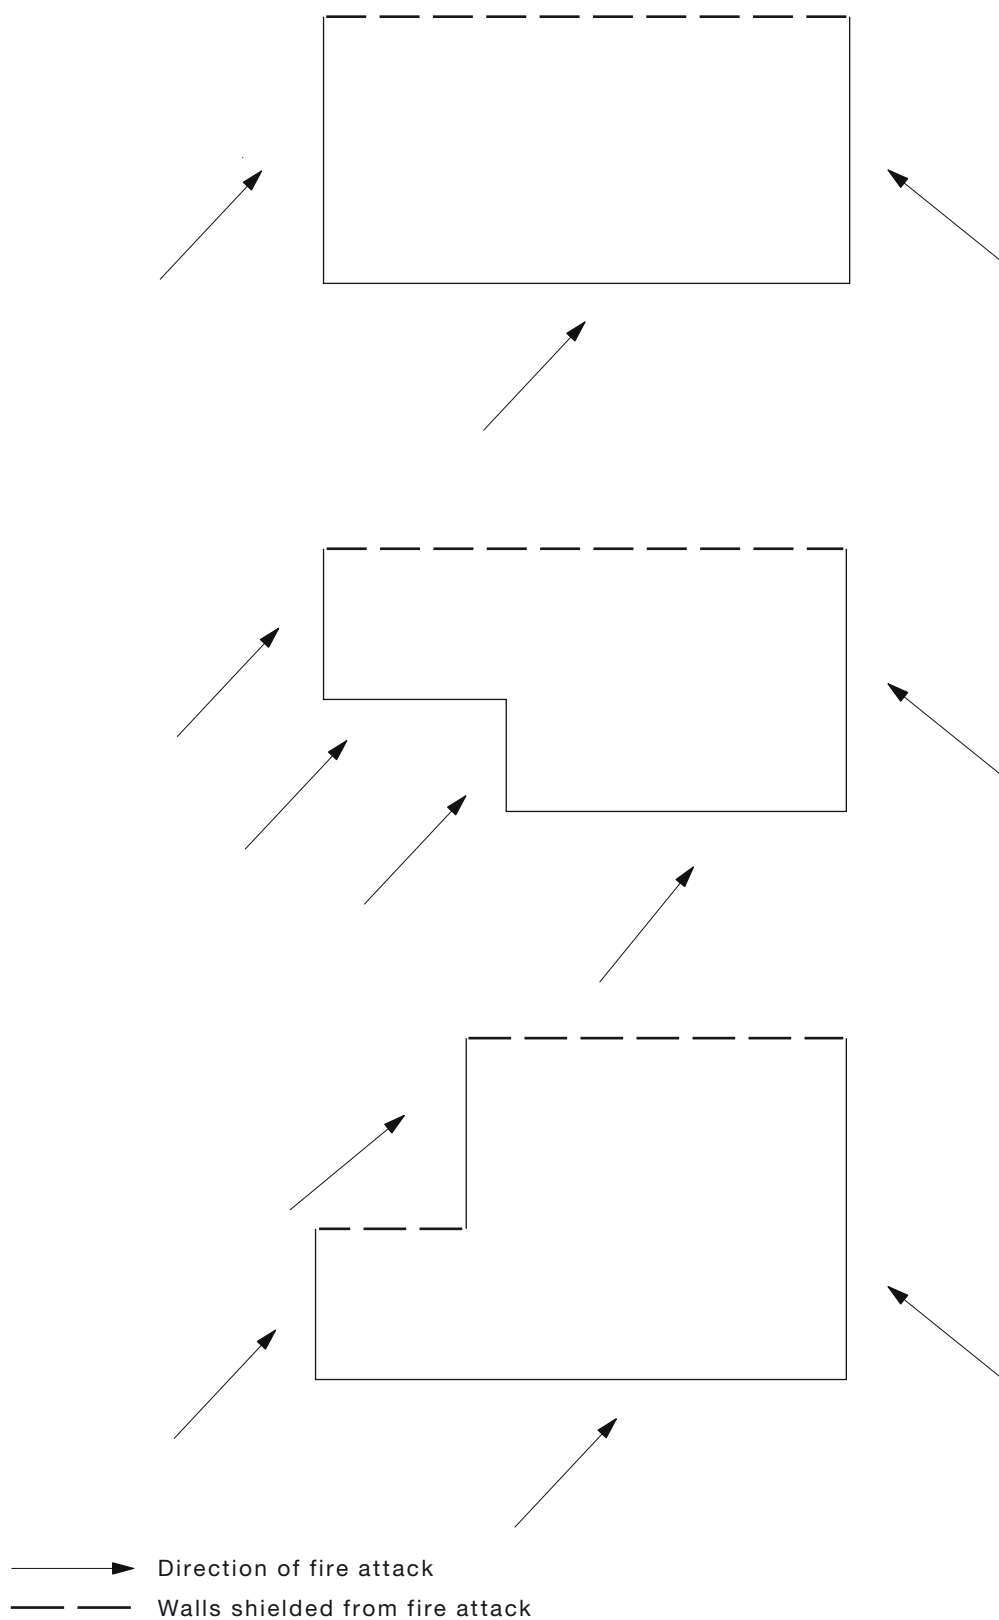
EXAMPLES OF WALLS SUBJECT TO SHIELDING
